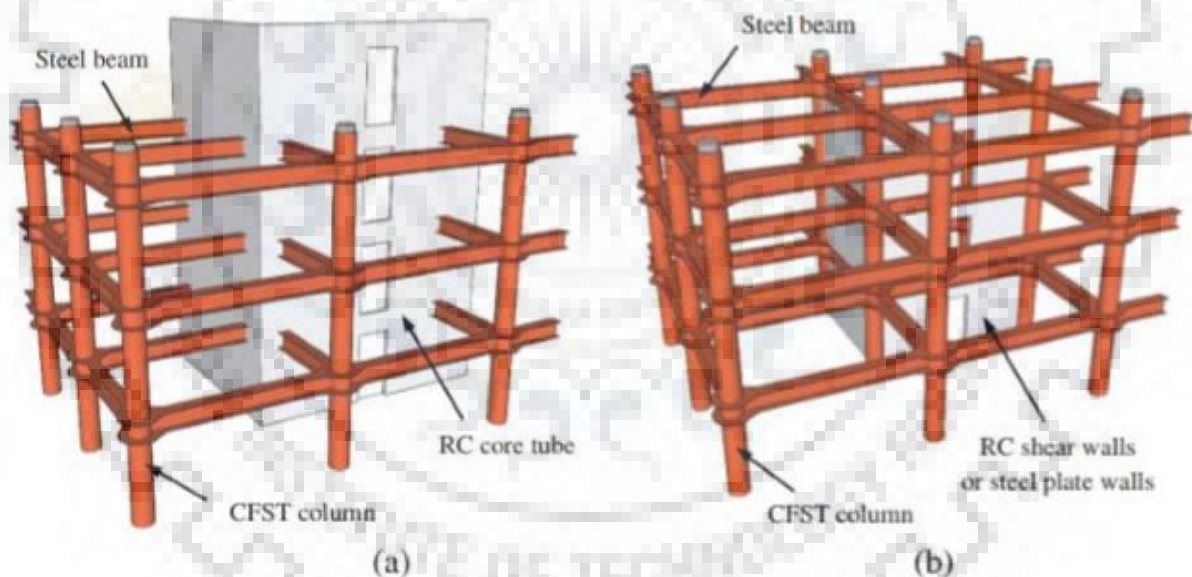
CFST systems with a) RCC core tube b) RC shear walls
